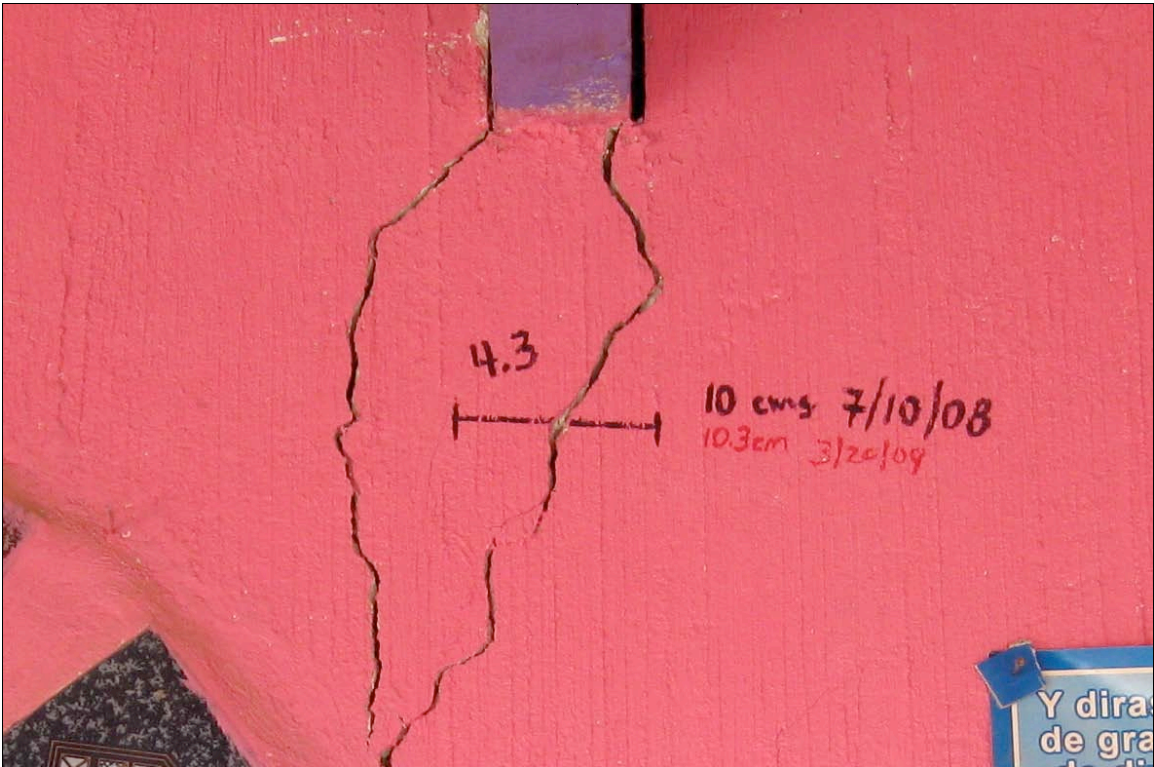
Type 2 Crack from Window or Door to Roof Beam
